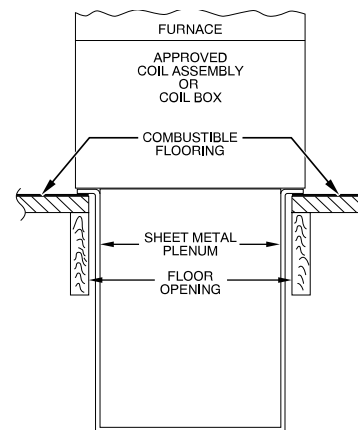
Furnace, Plenum, and Coil Assembly or Coil Box Installed on a Combustible Floor
